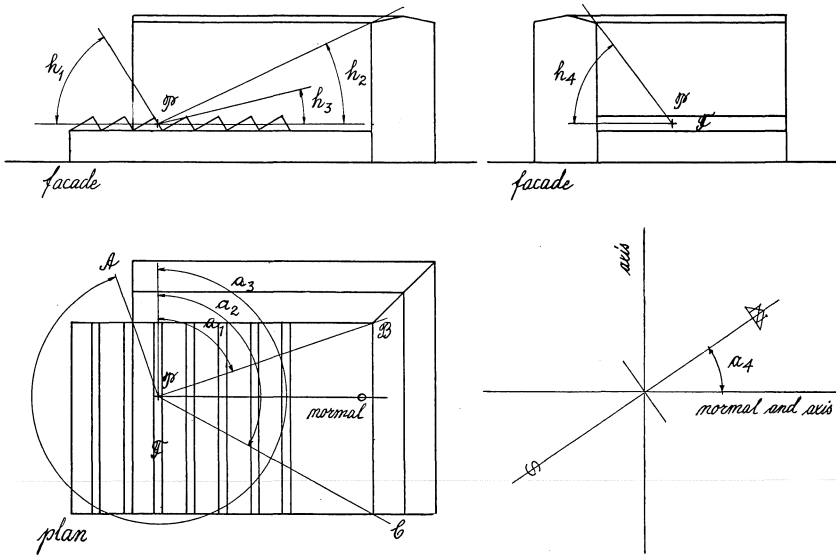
Plan and facades of a factory building. The heat radiation on the roof-light F in the point P is required.
